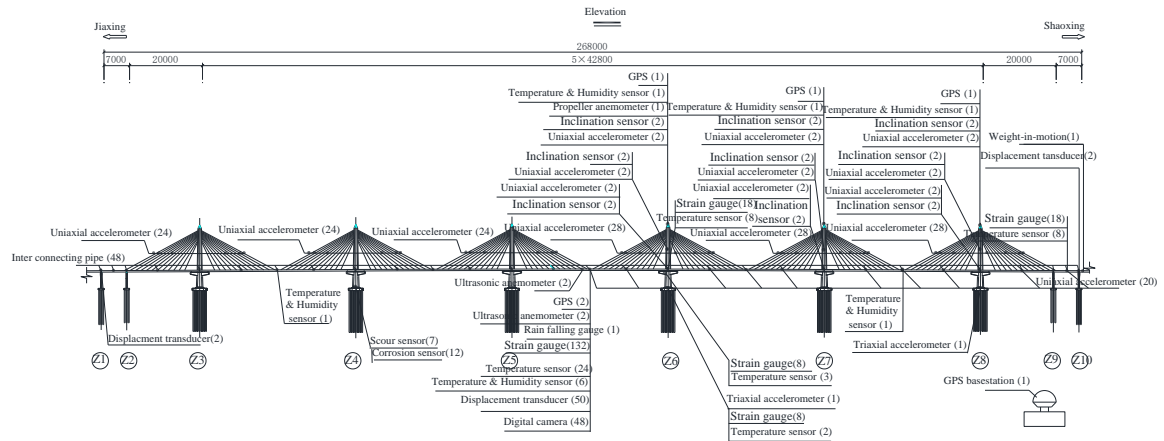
Layout of sensors for a six-tower cable-stayed bridge in China
